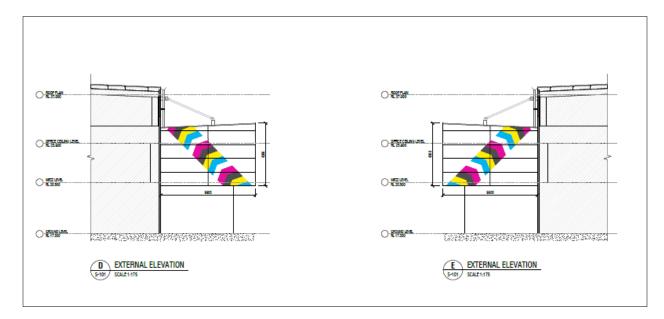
Proposed side elevation (Source: 2M Creative, 2023)
